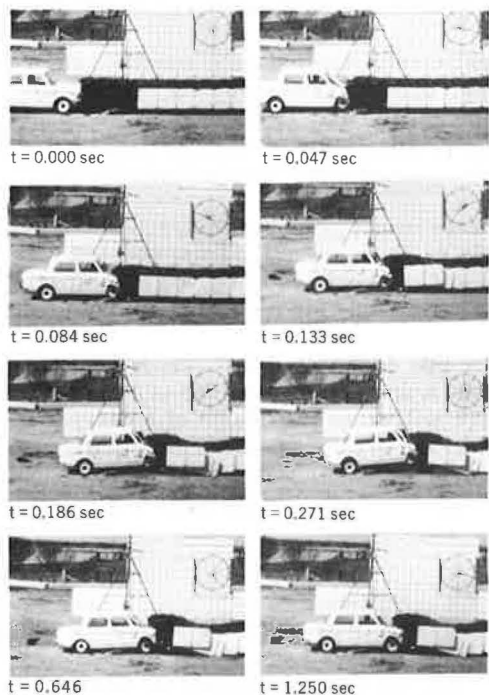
Sequential photographs of Test C (view perpendicular to barrier).
